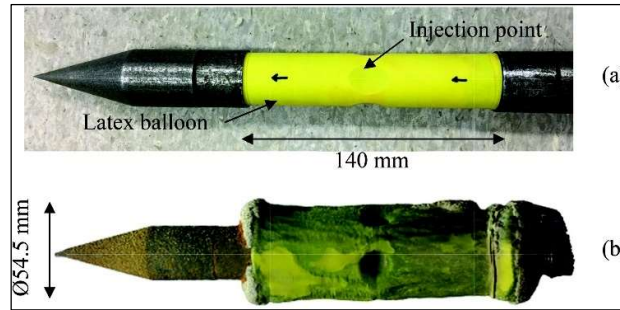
Photograph of (a) x-Nail with grouting facility and (b) grouted nail showing three-dimensional grout bulb [22].
